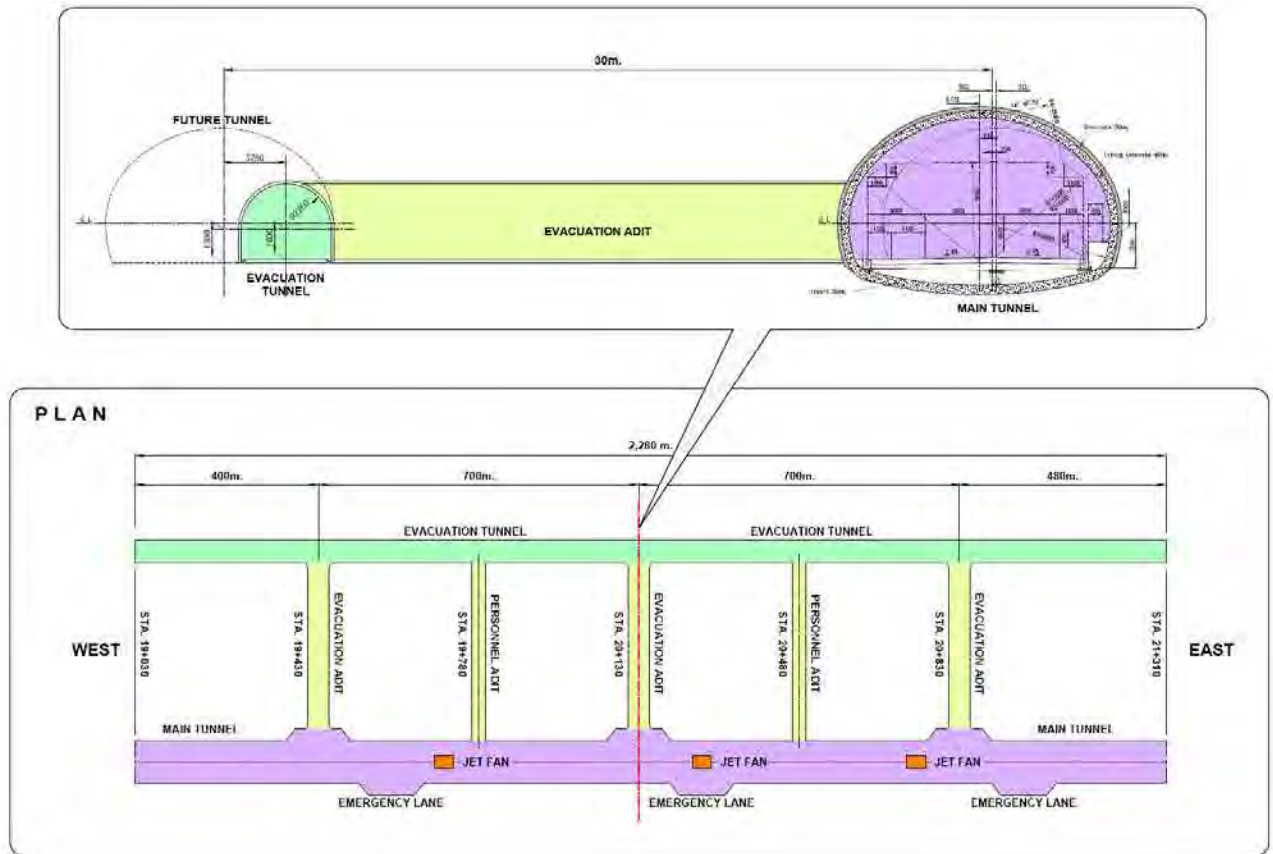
LAYOUT PLAN FOR EVACUATION TUNNEL
